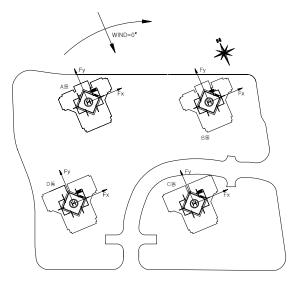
Wind Tunnel Testing Model (1/400) & Plan View
